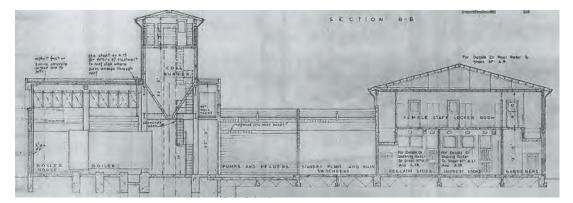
Building Section – Left to Right; Boiler House, Plantroom, Maintenance Building
